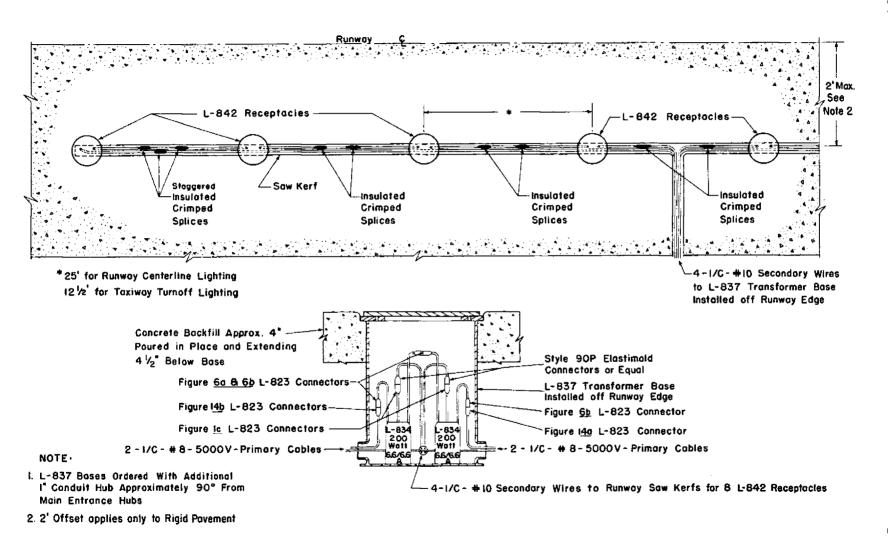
WIRING DIAGRAM RUNWAY CENTERLINE
